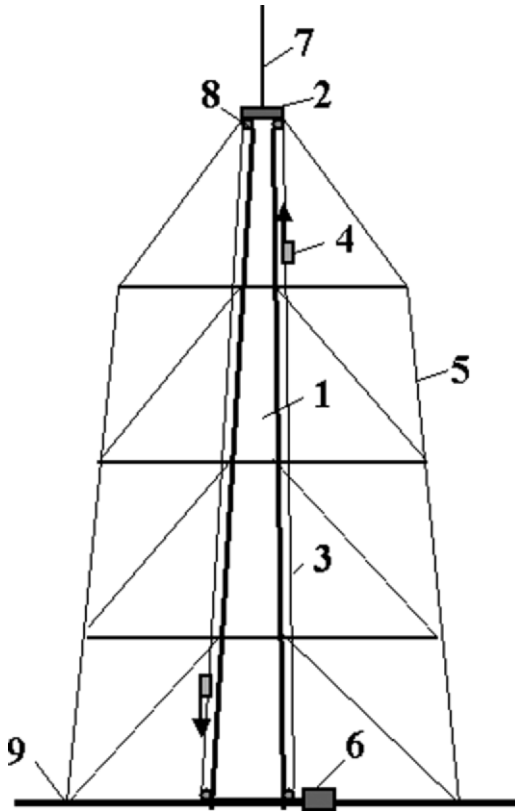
Pneumatic tower of height 3 km. 1 – Inflatable column of radius 5 m; 2 – observation desk; 3 – load cable elevators; 4 – passenger cabins; 5 – stabilizing cables; 6 – engine; 7 – radio and TV antenna; 8 – rollers of cable transport system; 9 – stability control
